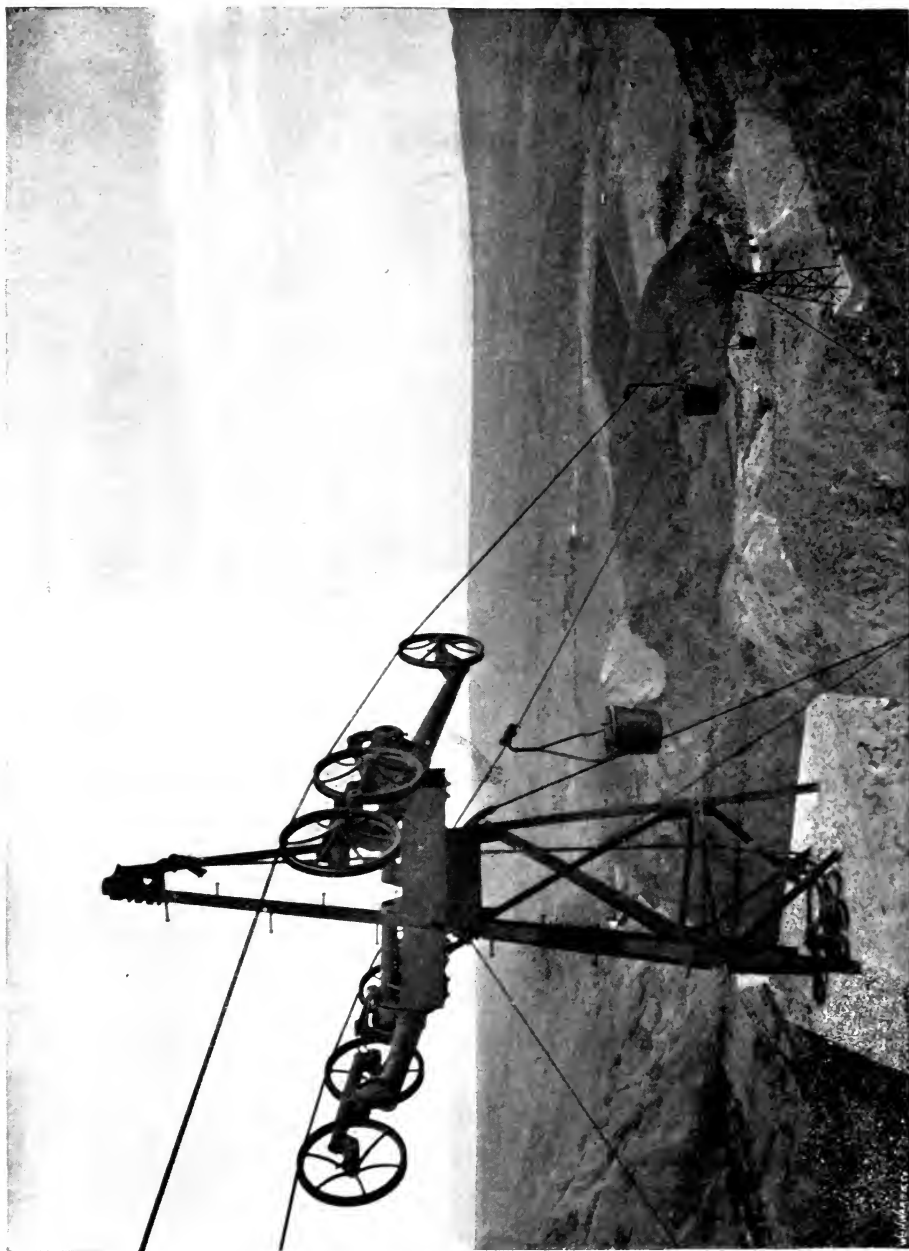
PART VIEW OF ROPEWAY LOOKING TOWARDS DISCHARGING STATION.
